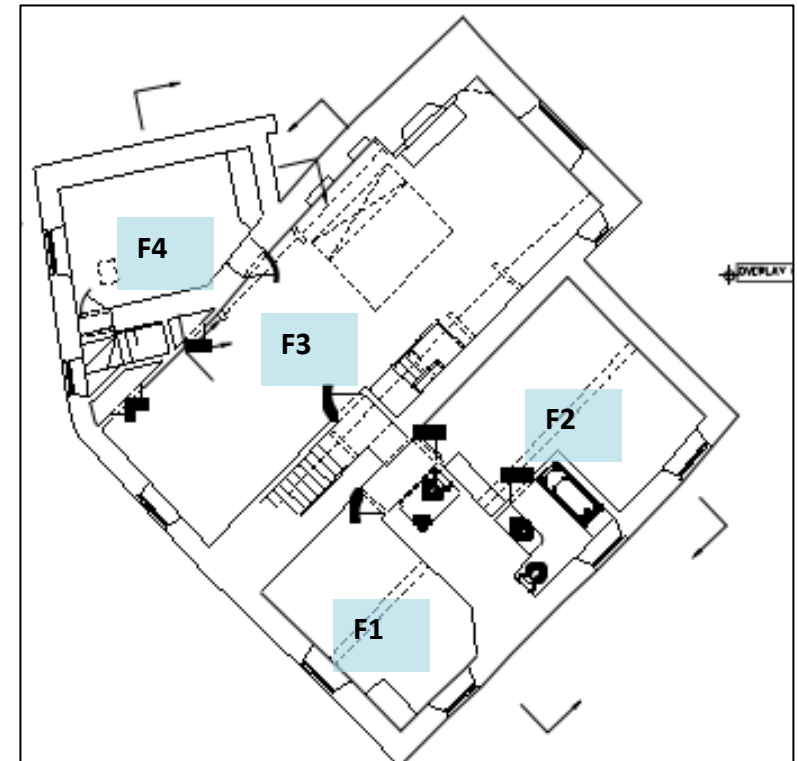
First floor plan with room codes, taken from survey drawings provided by Advanced Surveys.
